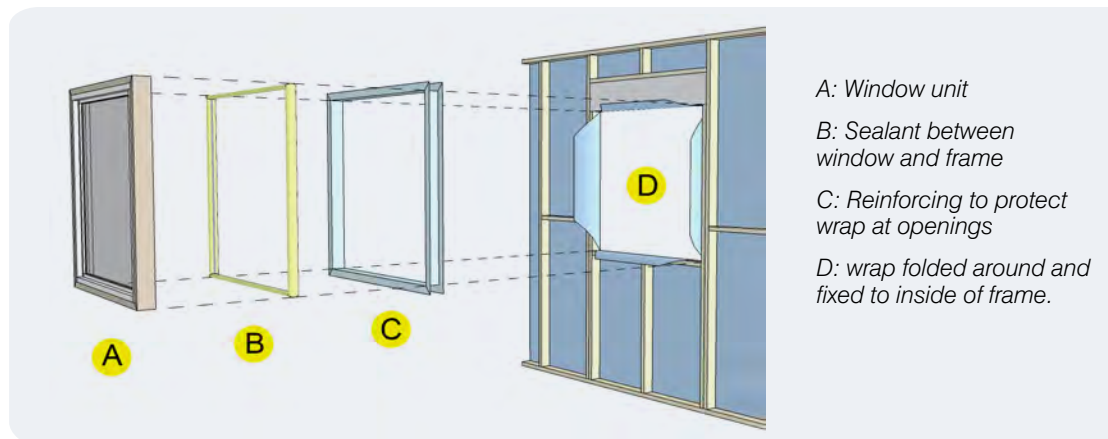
Seal wall openings. Installation of doors and windows into a well-wrapped wall
